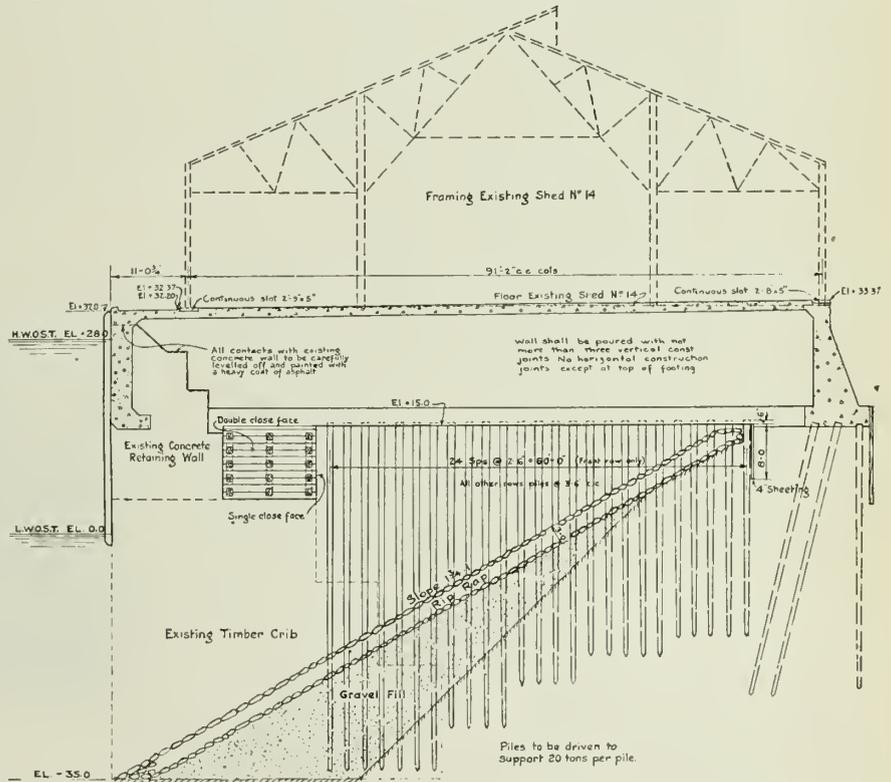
Sectional Elevation Showing Connection with Existing Berth No. 14.
